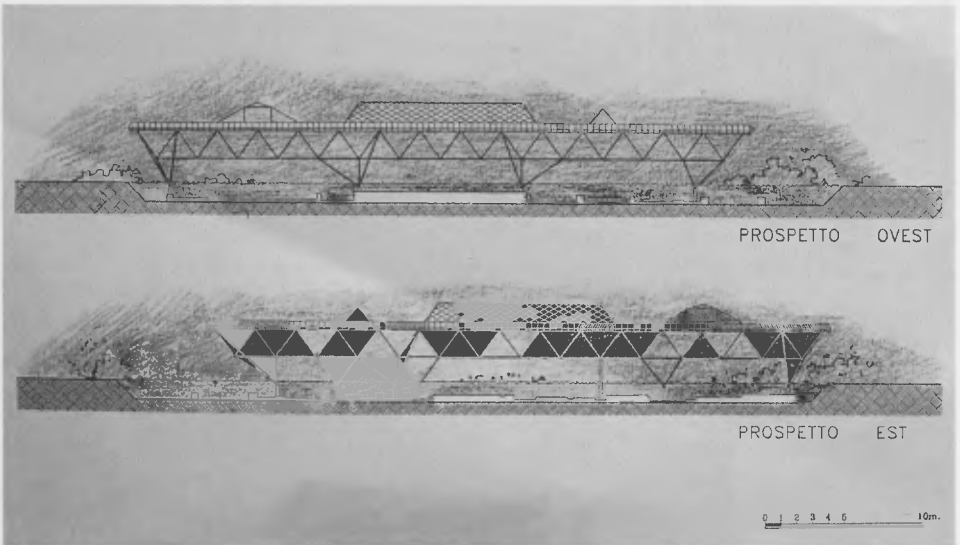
Castelleone di Suasa, elevation of the new shelter, elevation front.
